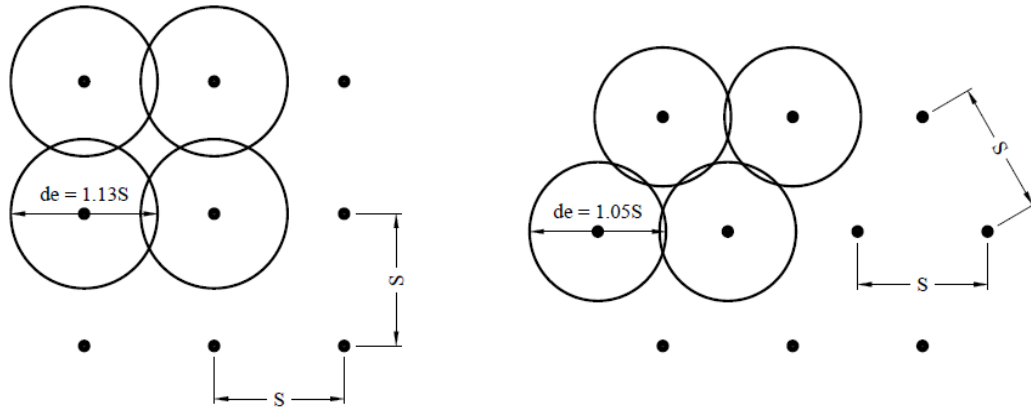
Plan View Showing Layout of PV Drains with a) Square Spacing, b) Triangular Spacing
